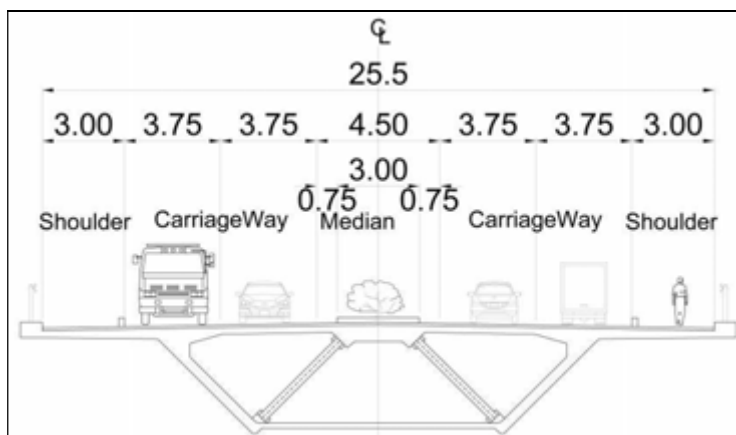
Typical Cross Section of Neak Loeung Bridge
